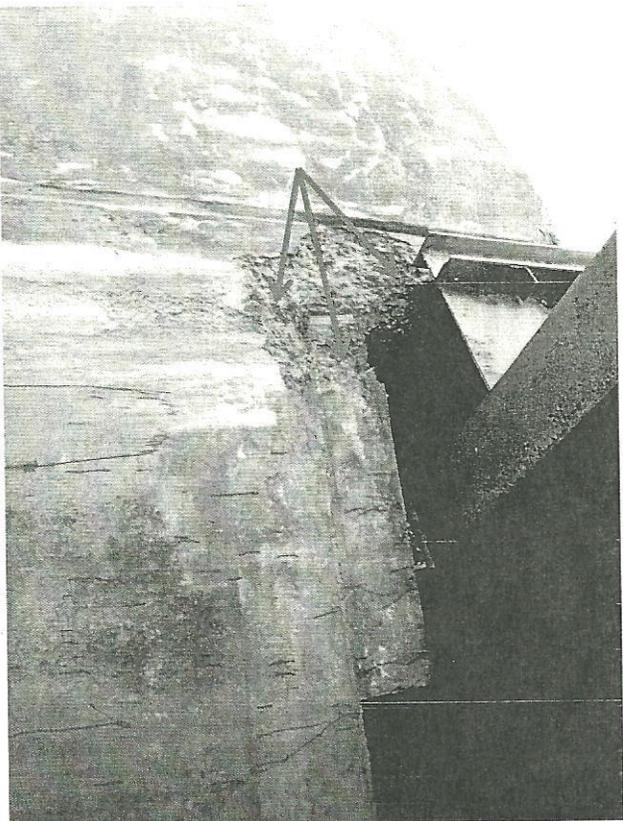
View of cheek wall, bearing pedestal & abutment, exhibits severe scaling at northeast corner of east abutment.
